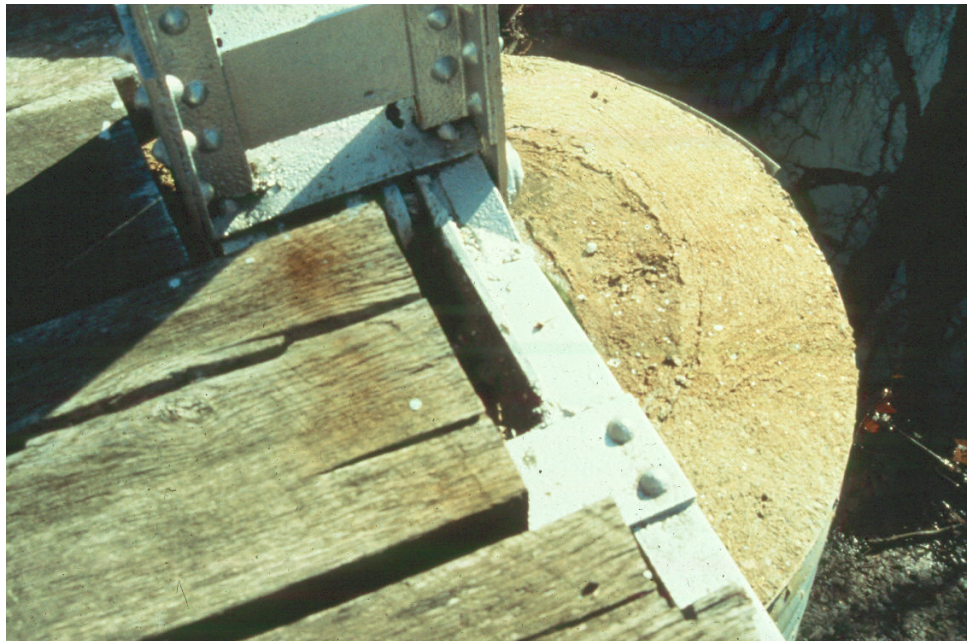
Bearing and Shear Area on a Timber Deck
